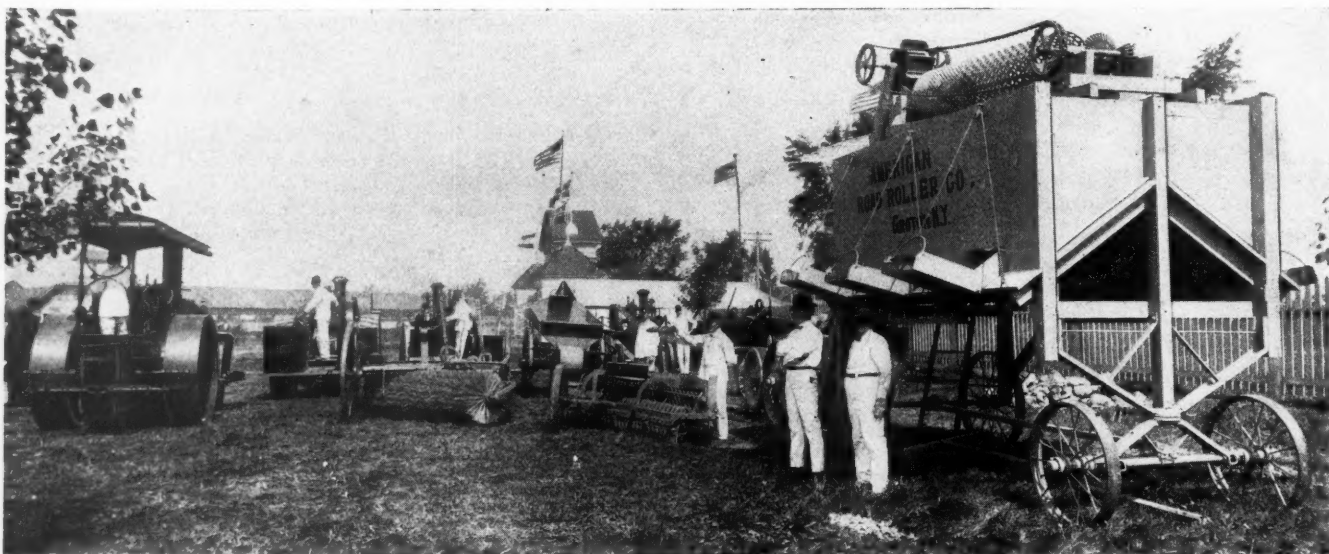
EXHIBIT OF THE AMERICAN ROAD ROLLER COMPANY AT NEW YORK STATE FAIR
